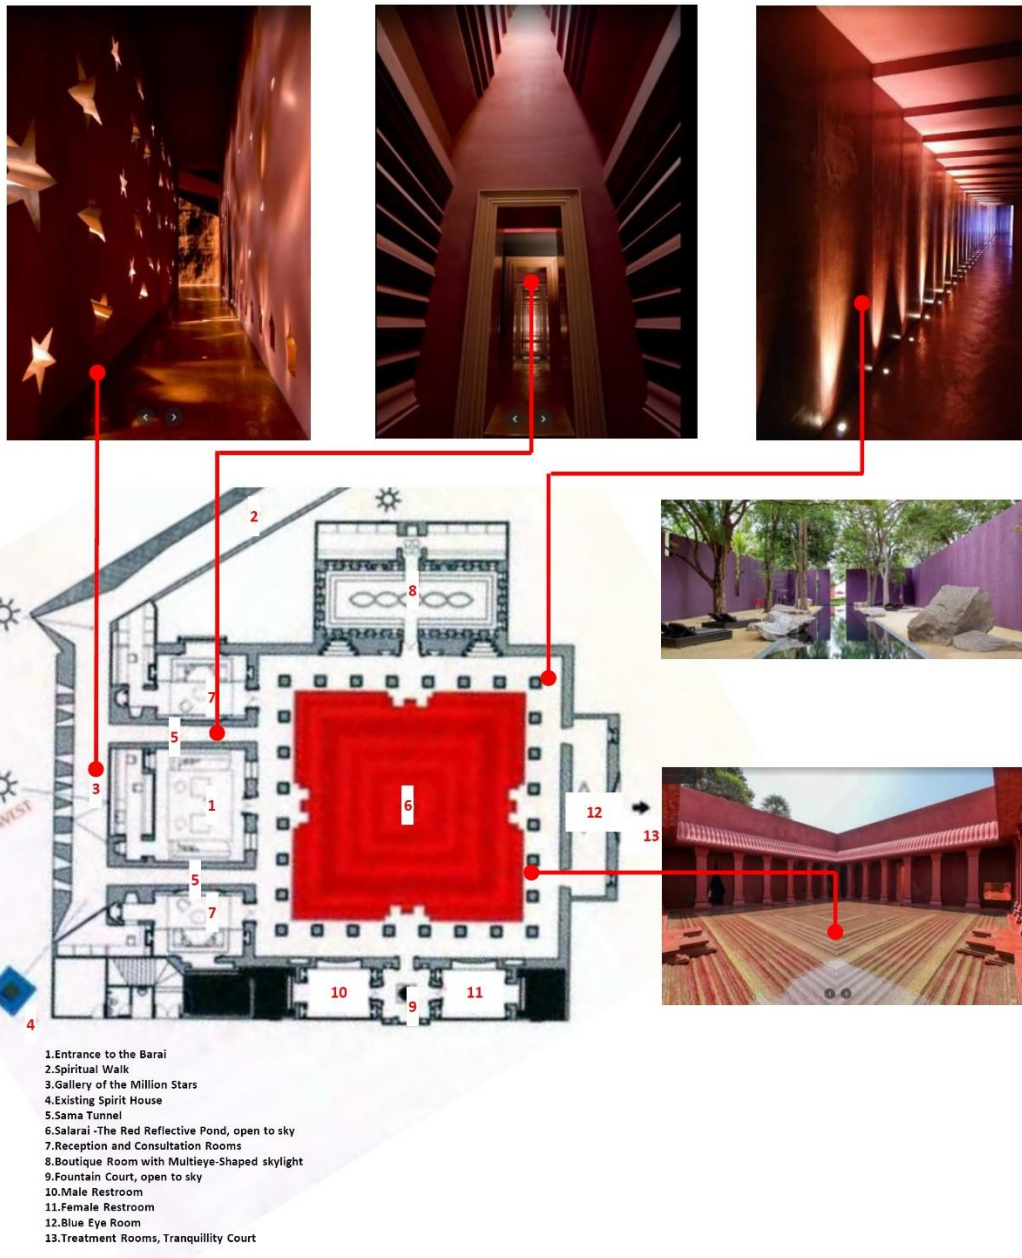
Floor plan of The Barai, Hyatt Regency, Thailand.
